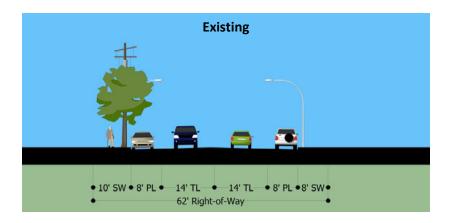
North San Fernando Boulevard: Concept Plan
